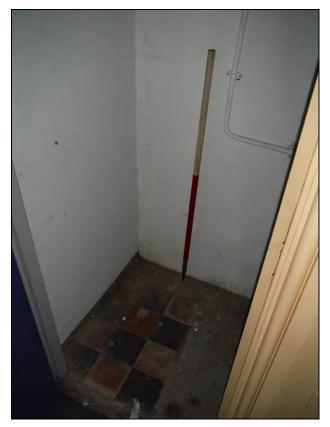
Small section of checkerboard tiled floor at the top of the staircase in Room B1 (Scale = 1m).
